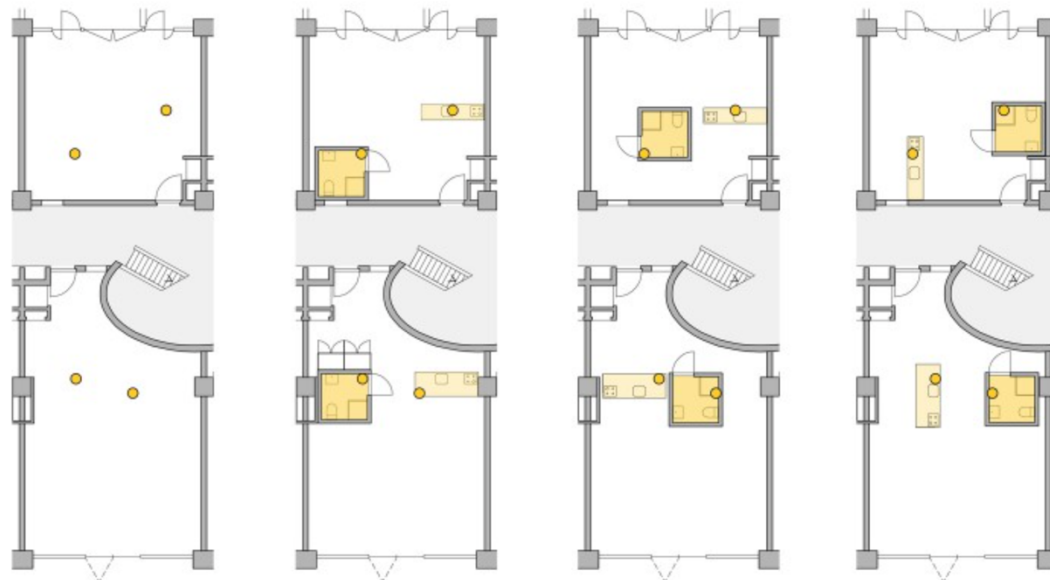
Flexible floorplans of Anton apartments (Diederendirrix, 2010)
